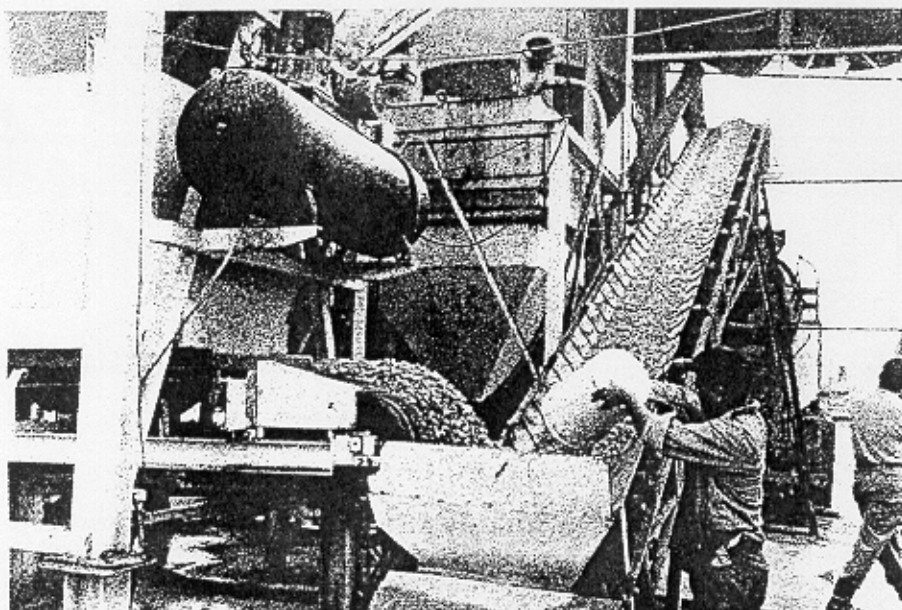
Addition of "Xypex" powdered admixture at batching plant
